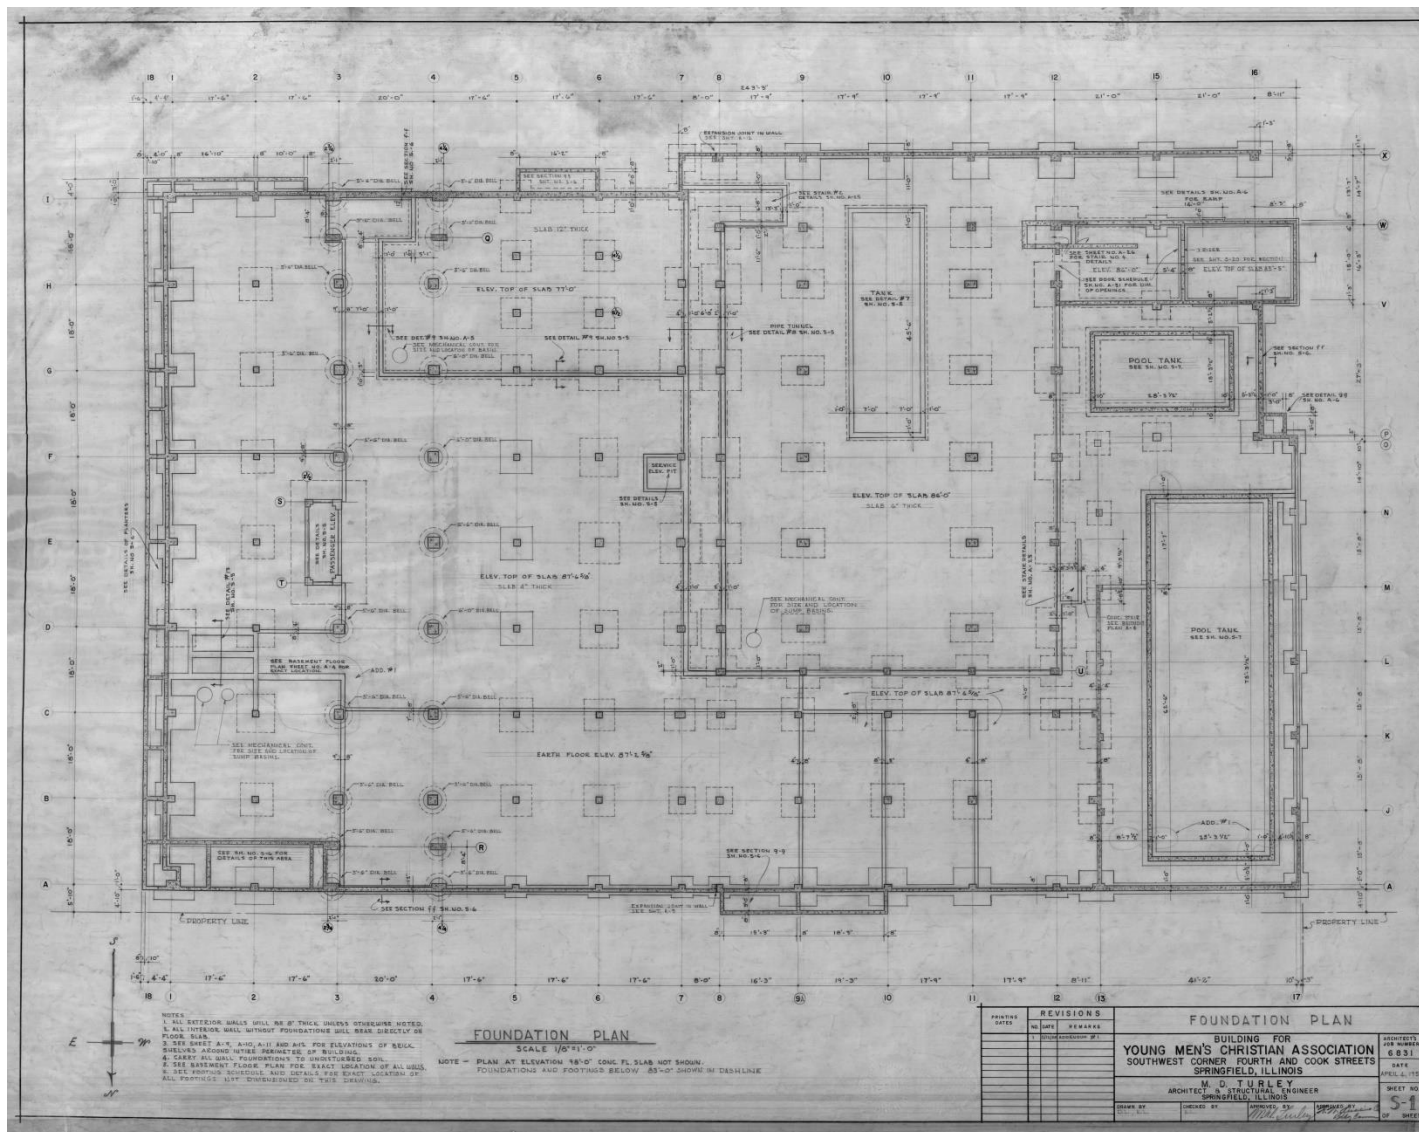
Foundation Plan (Turley 1958; Sheet No. S-1).
